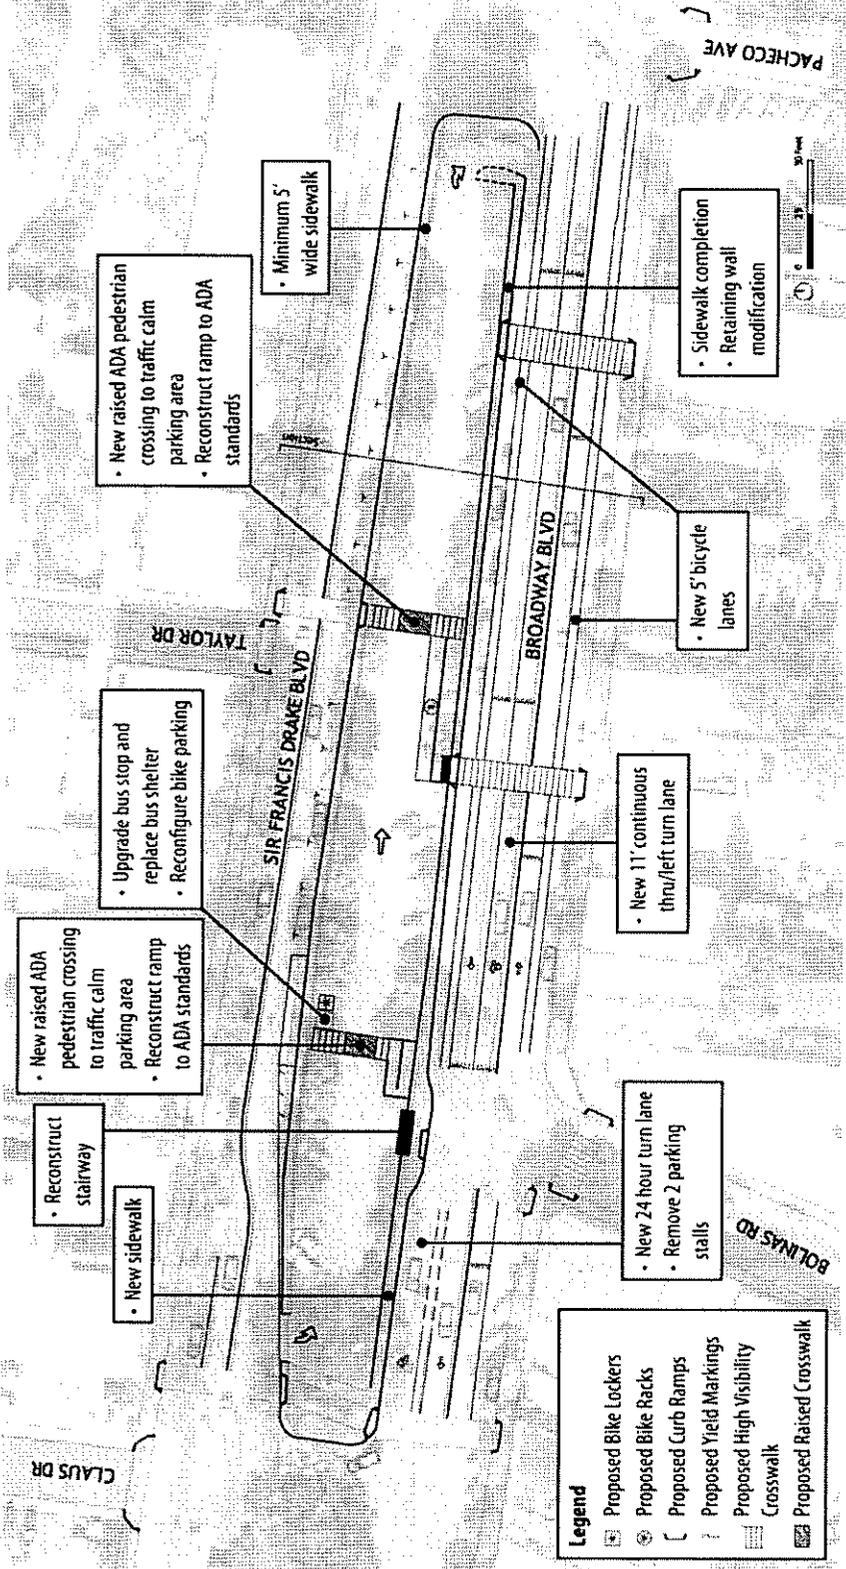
Plan View of Proposed Improvements for Project 6: Broadway Boulevard Fairfax Parkade
